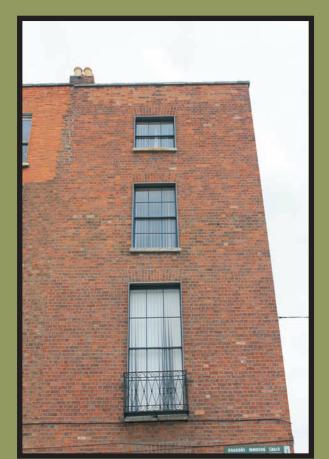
Typical hierarchy of sash windows to Georgian townhouse, with 6-over-6 sashes to first and second floors and 3-over-3 sashes above
